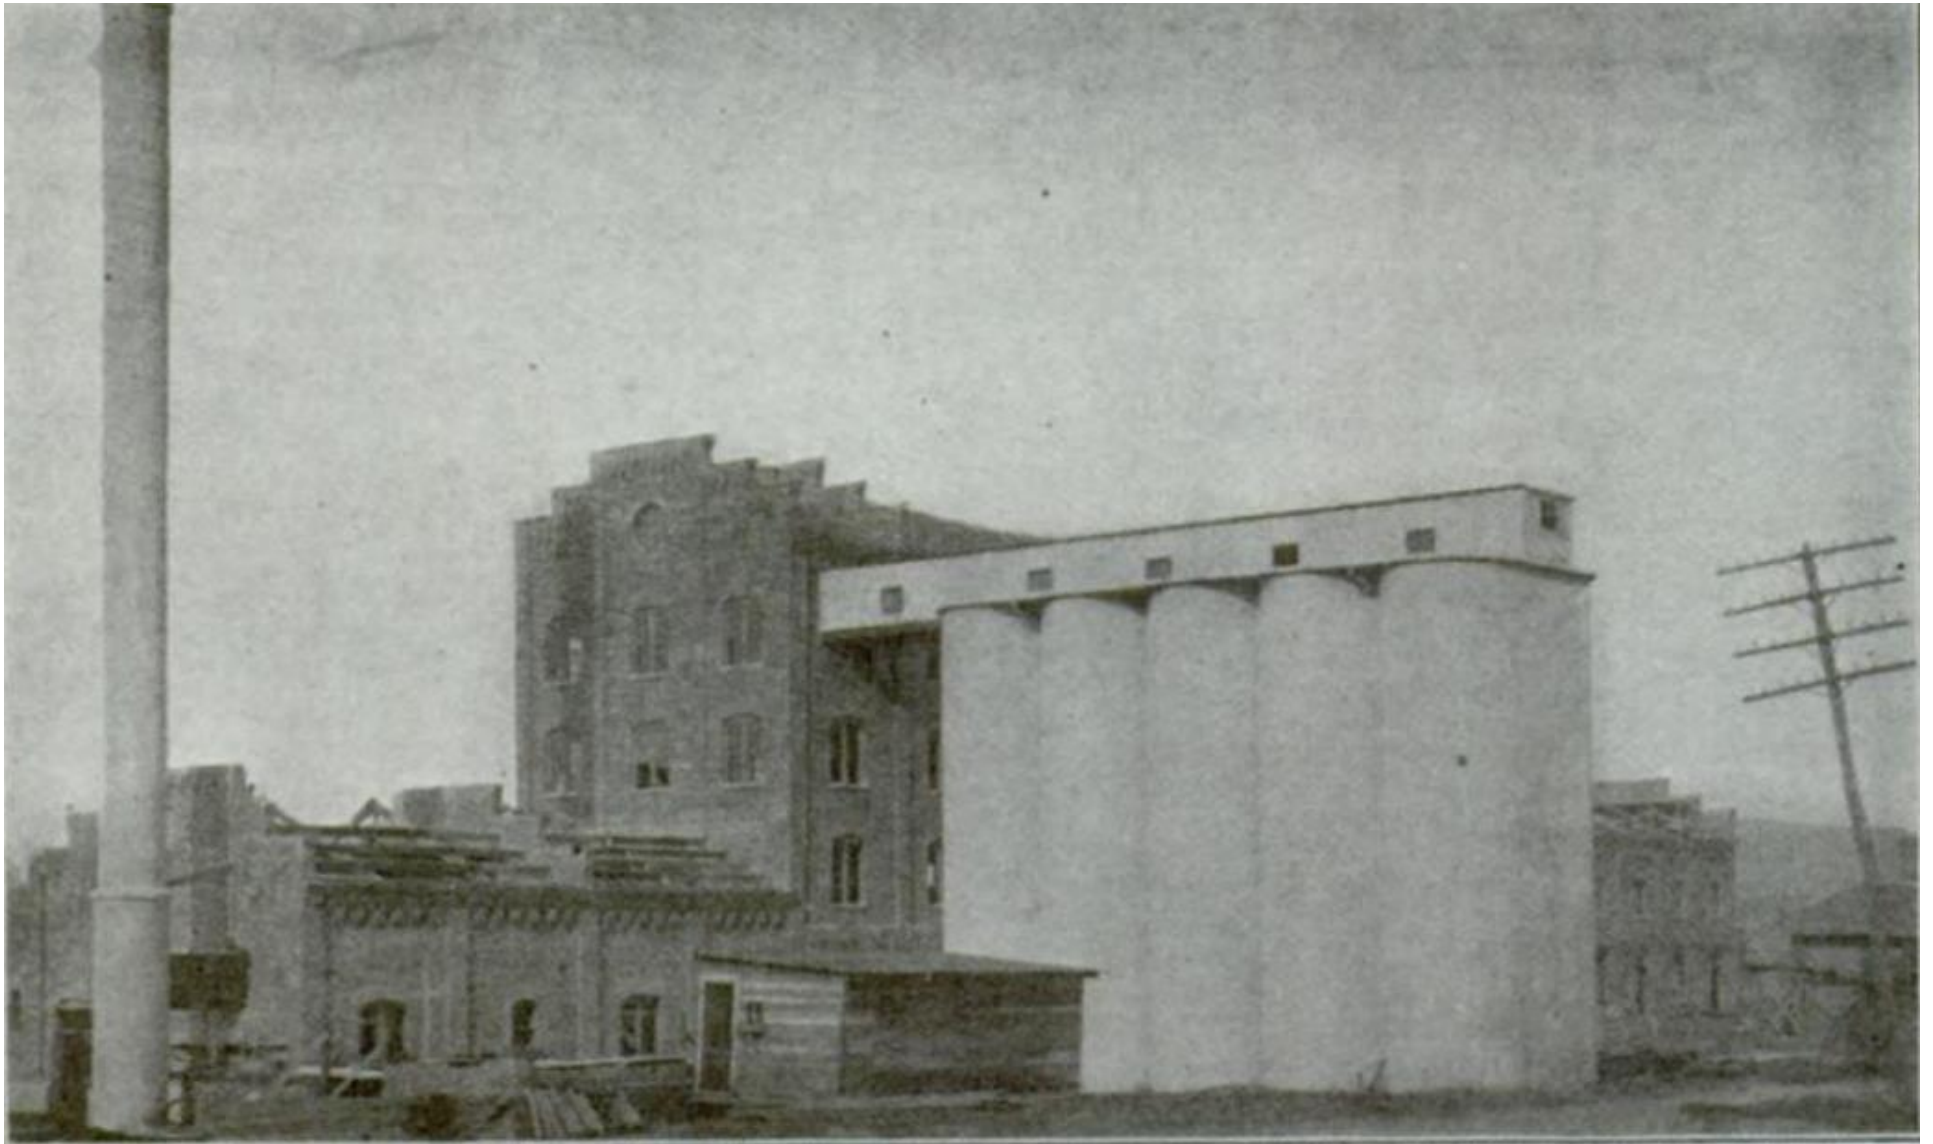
On West Walnut Street, "New Model Mill and Elevator now [1909] building. Cost, \$100,000."²²⁸
